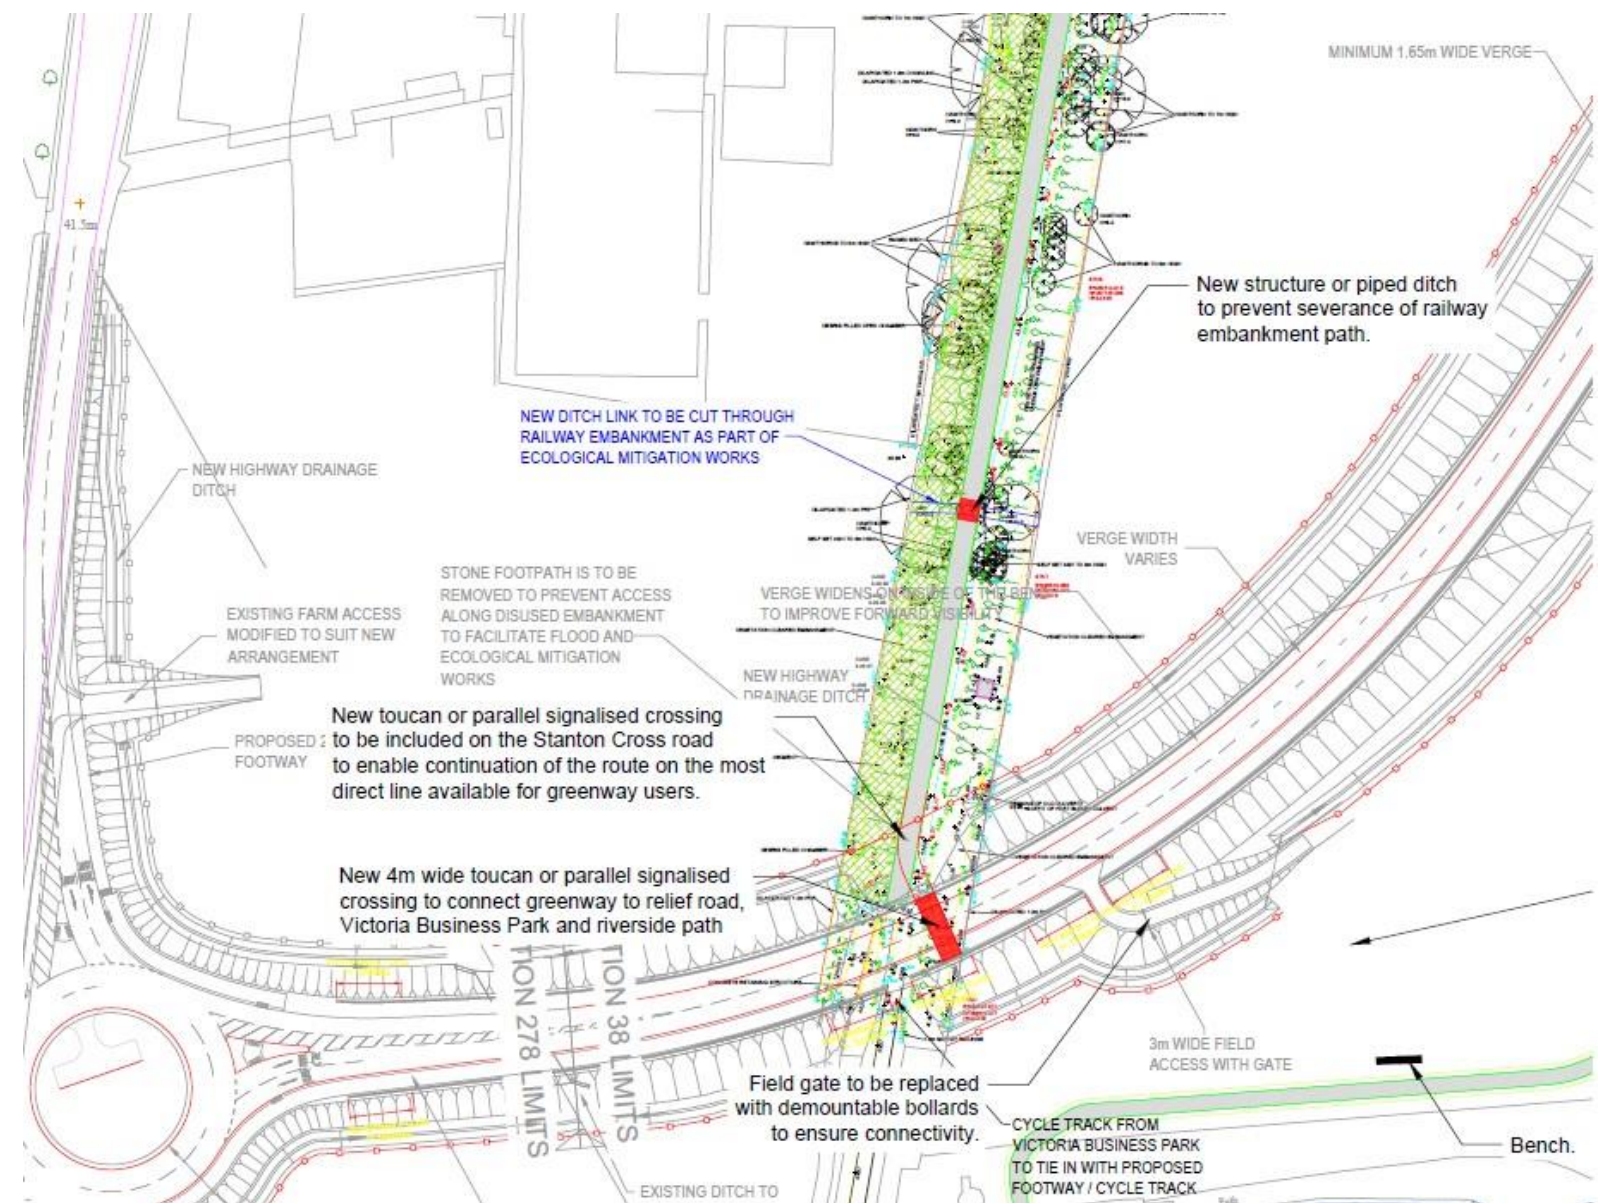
Indicative plan for the development of the railway alignment (southern section).
